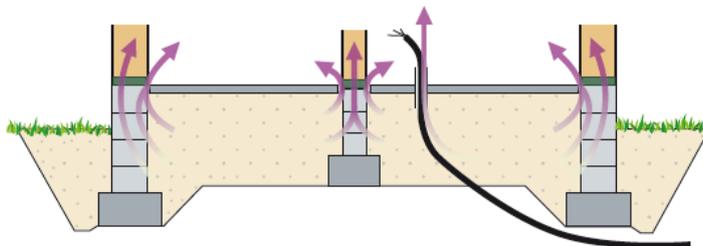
Entry routes of soil air in a Finnish slab-on-grade foundation. The foundation wall is of permeable light-weight concrete blocks (STUK 2008).
